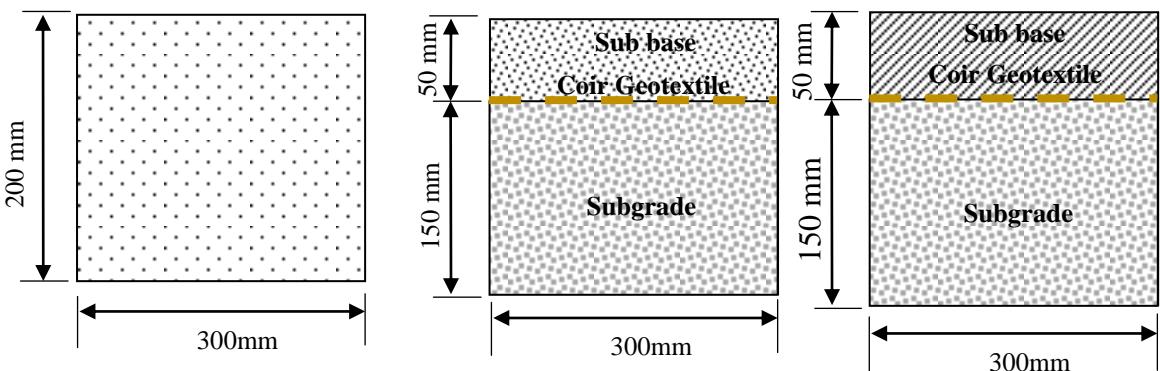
Reinforced and unreinforced pavement model layer at sub-base layer III
